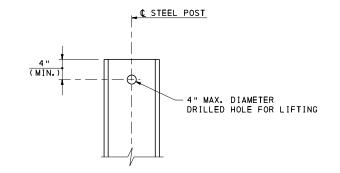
(DETAIL FOR CAISSON SHOWN DETAIL FOR FOOTING IS SIMILAR)
